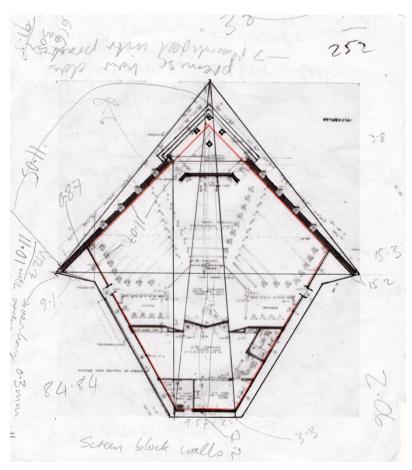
Working floor plan drawing 2023, 23.5 x 21 cm.
